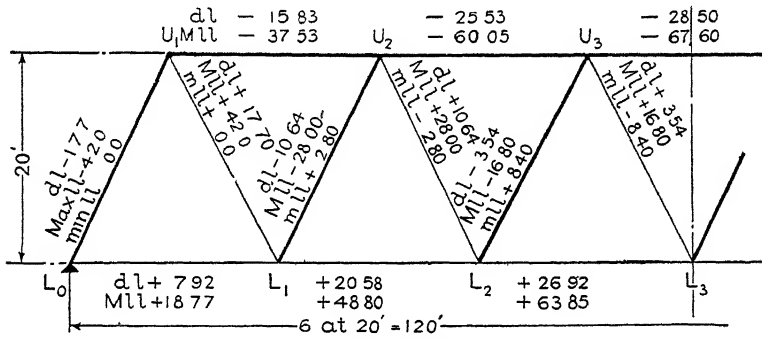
Dimension and Stress Diagram of Warren Half-Truss under Live Load.
